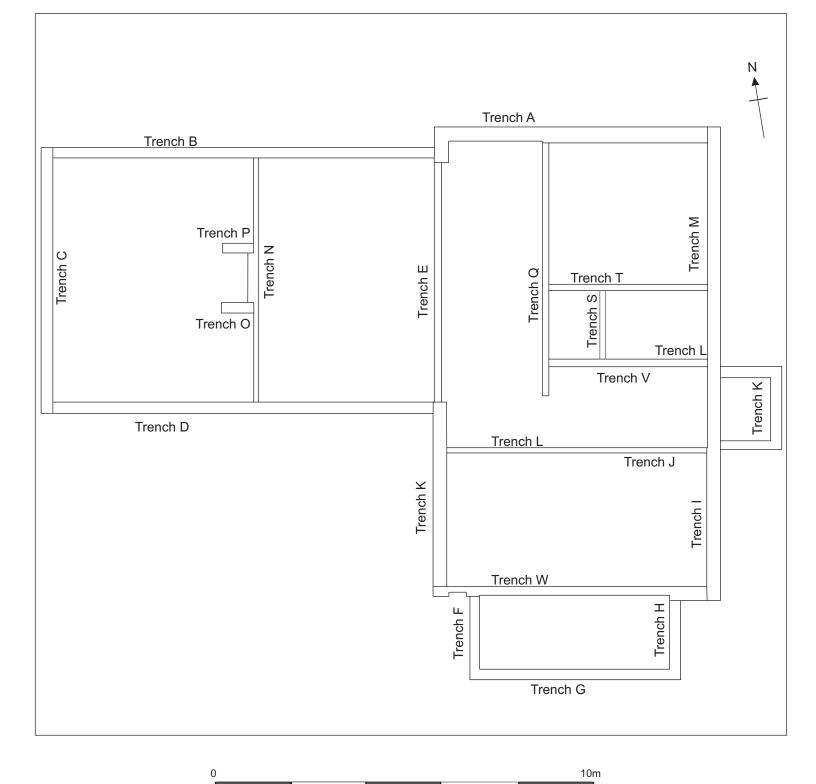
Ground-floor Plan of Foundation Trenches. Scale 1:100
